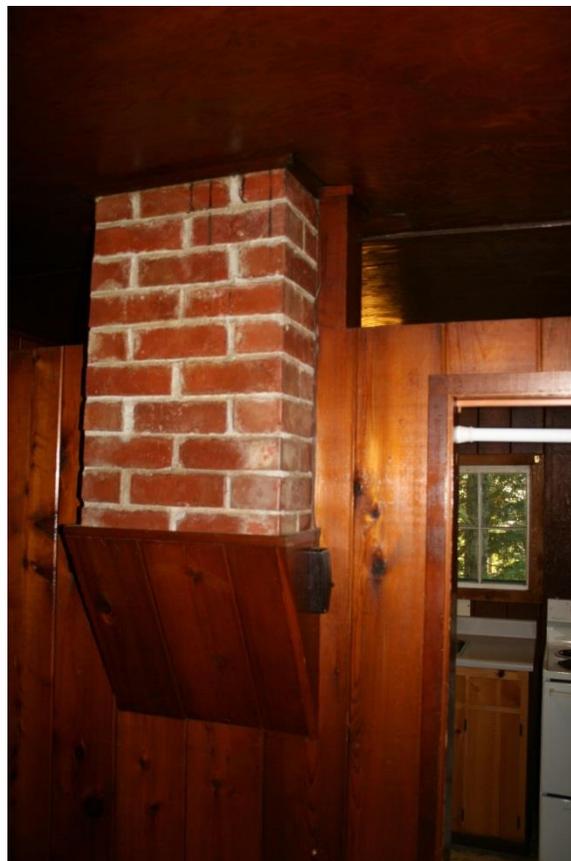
Cabin 7 existing brick masonry chimney not in use is being supported by wood framing. Chimney does not appear to be supported by a foundation. Suggest complete removal of brick masonry chimney within cabin and above the roof. Similar condition is also found in Cabin 8.
